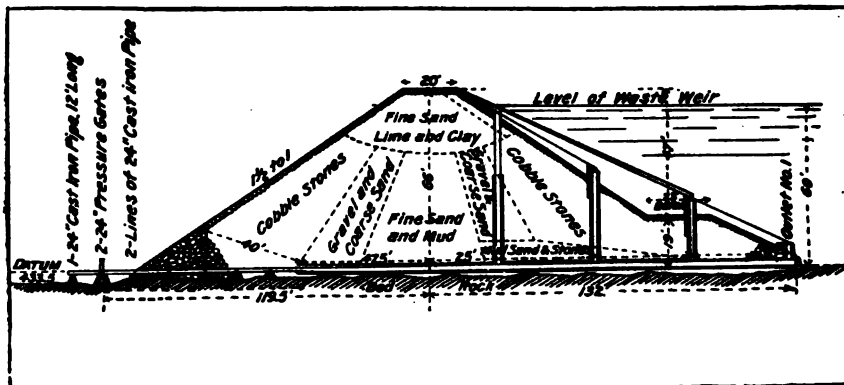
CROSS-SECTION OF LA MESA DAM.
